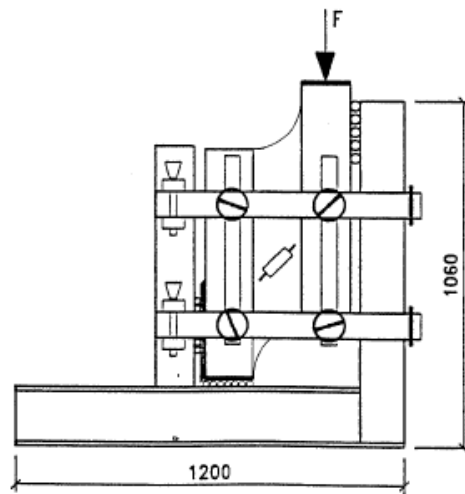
Loading arrangement for panel shear test (sizes in mm)
